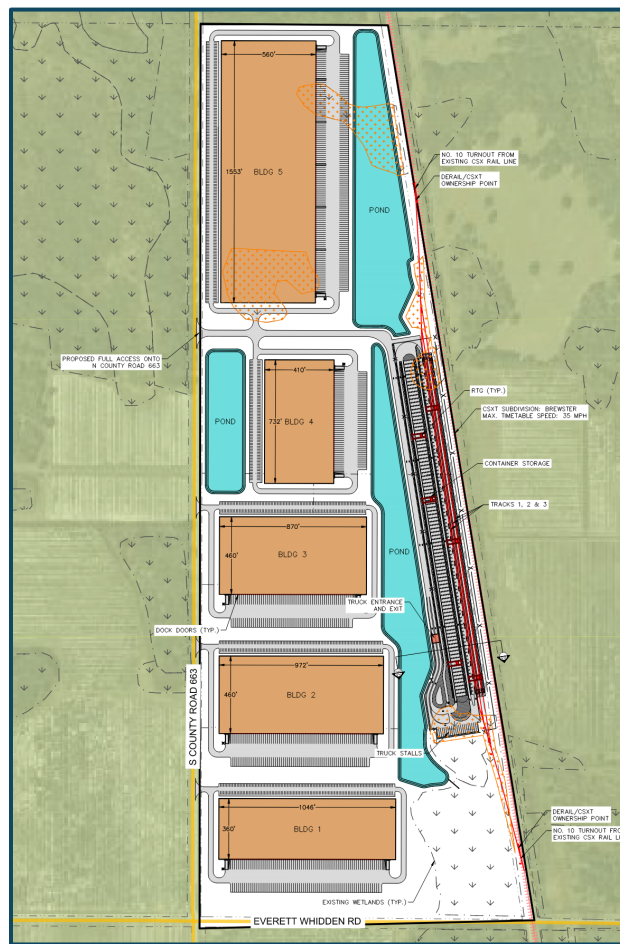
Site 6 Intermodal Conceptual Site Plan
